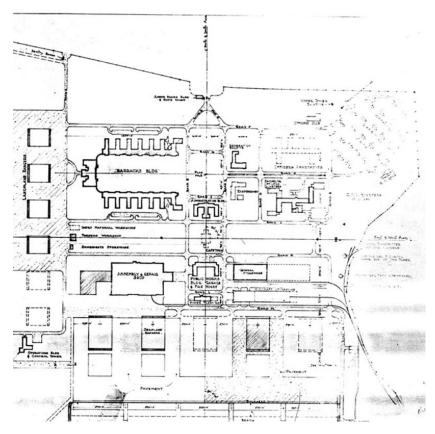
1940 plan of NAS Alameda. Courtesy of Department of the Navy, NAS Alameda Plan Room
